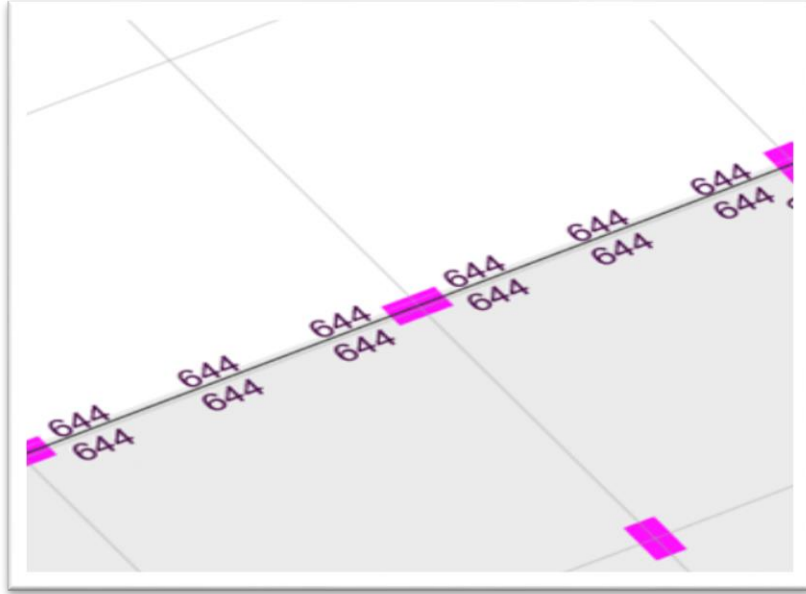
Total longitudinal reinforcement for beam B7 & B8 in ETABS.
